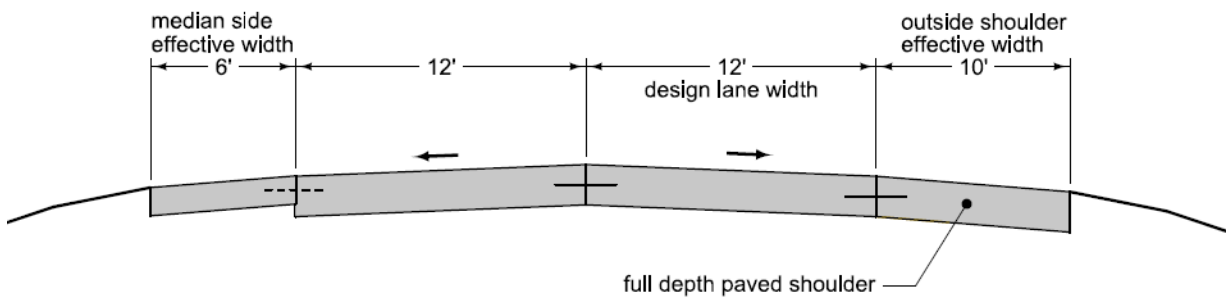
4-lane rural roadway with full depth paved shoulder on the outside.
